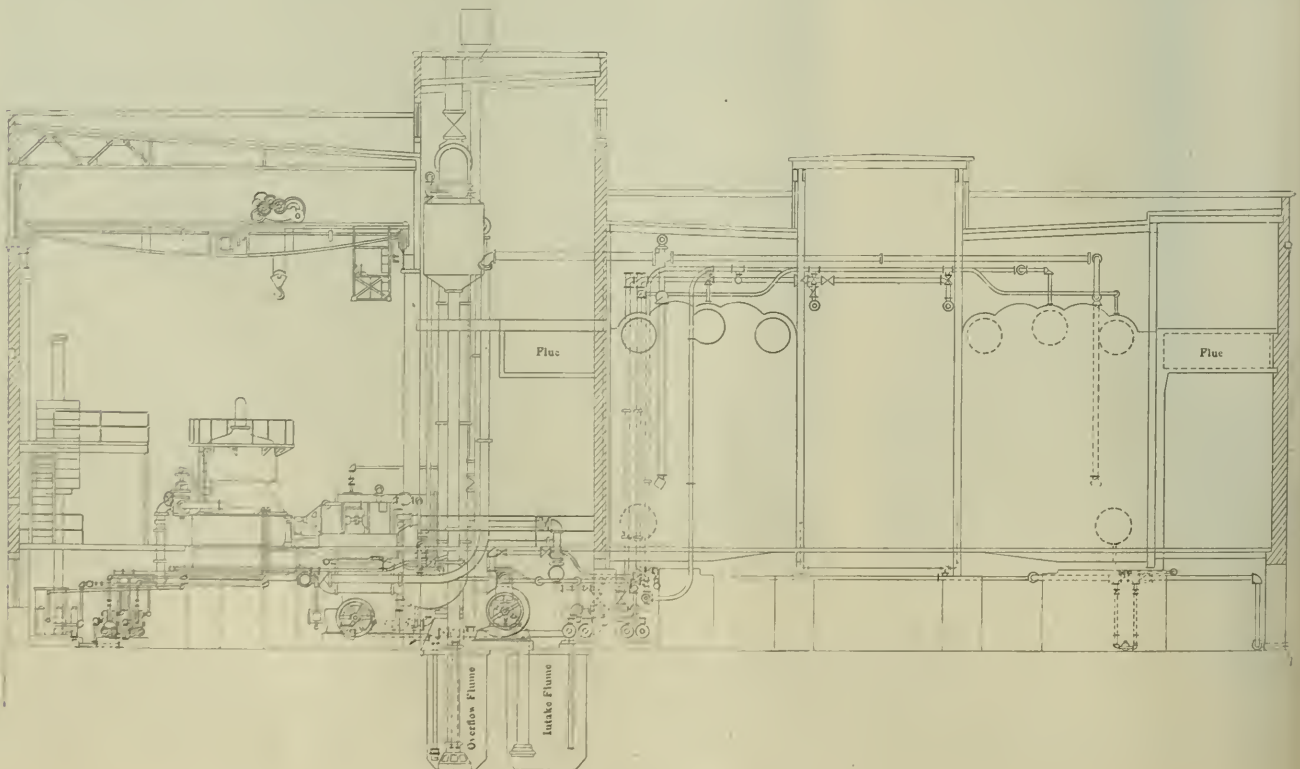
SECTIONAL ELEVATION THROUGH PLANT
